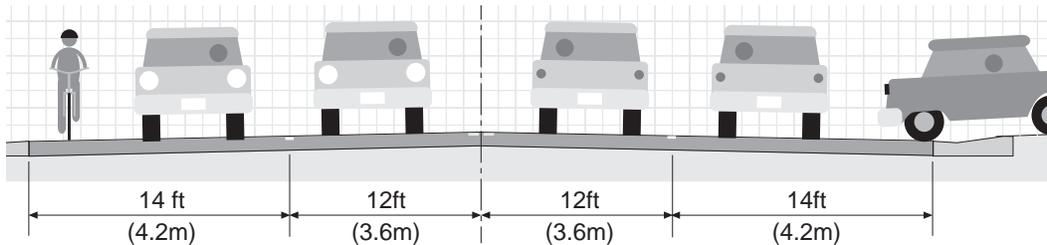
Wide outside lanes provide clearance for motorists entering driveways or cross streets or waiting to leave them.
